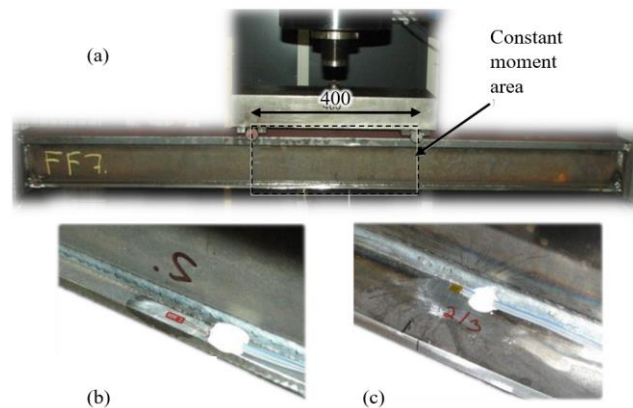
(a) Fatigue test set-up of the box girder specimens, and the instrumentation of the bottom flanges in (b) a box section specimen and (c) an I section specimen.
